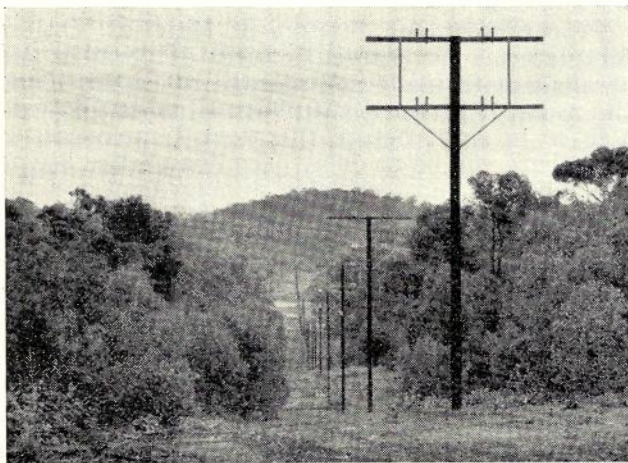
Seymour-Bendigo route, showing extent of clearing.
